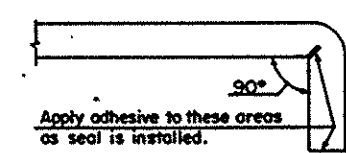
DETAIL "A" COMPRESSION JOINT IN ROADWAY
